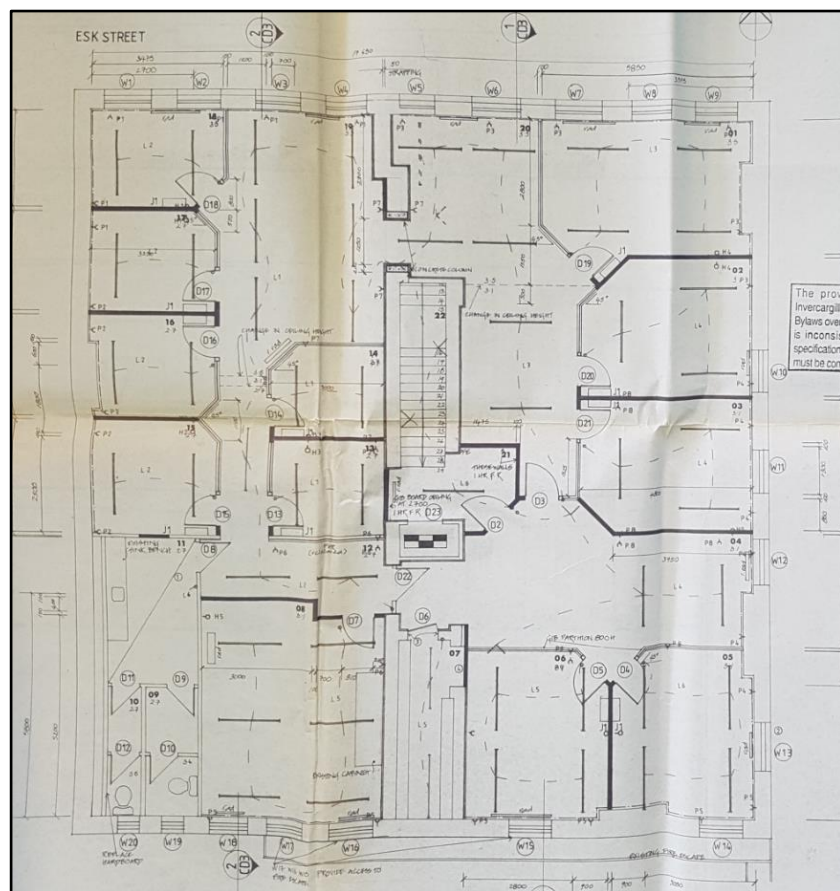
Details from 1990 plan of the Temple Chambers at 45-49 Esk Street, showing alterations to first floor plan (Bob Simpson & Associates, 1990).
